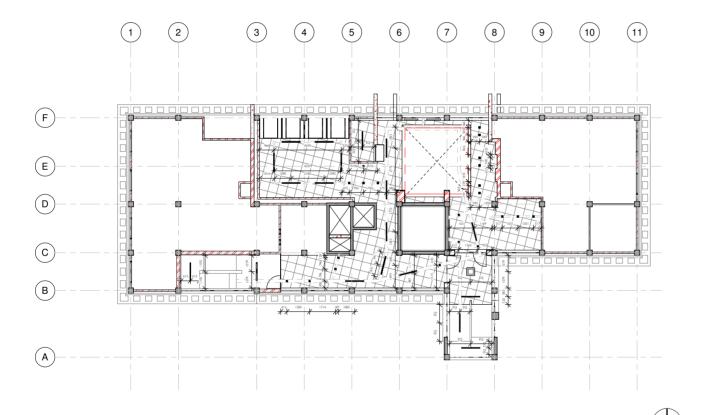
Second floor ceiling and lighting layout (by Author, not to scale)
